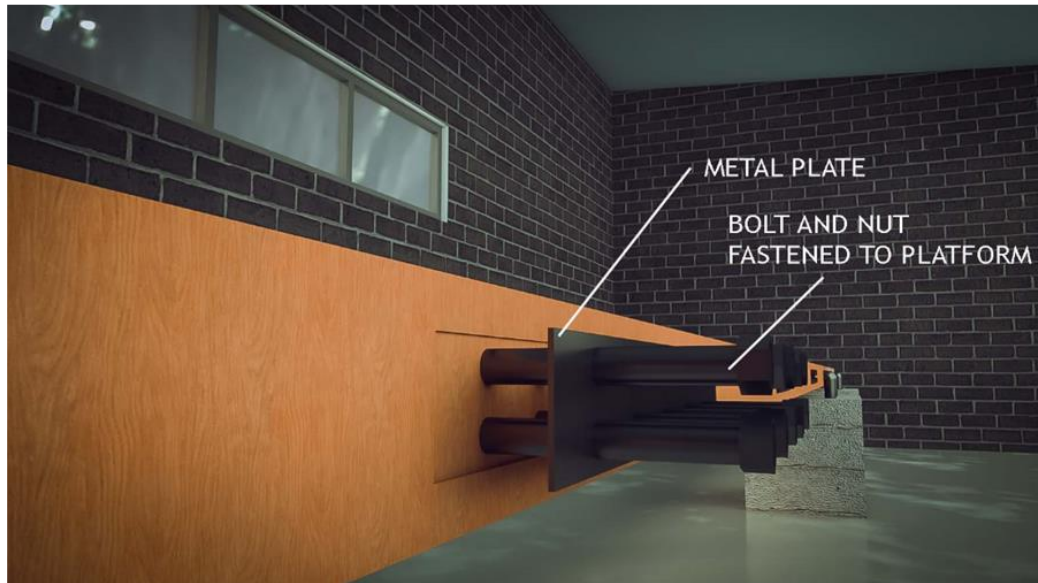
1mm steel plates fastened to the structure. When unfastened they simulate damage on a bridge
